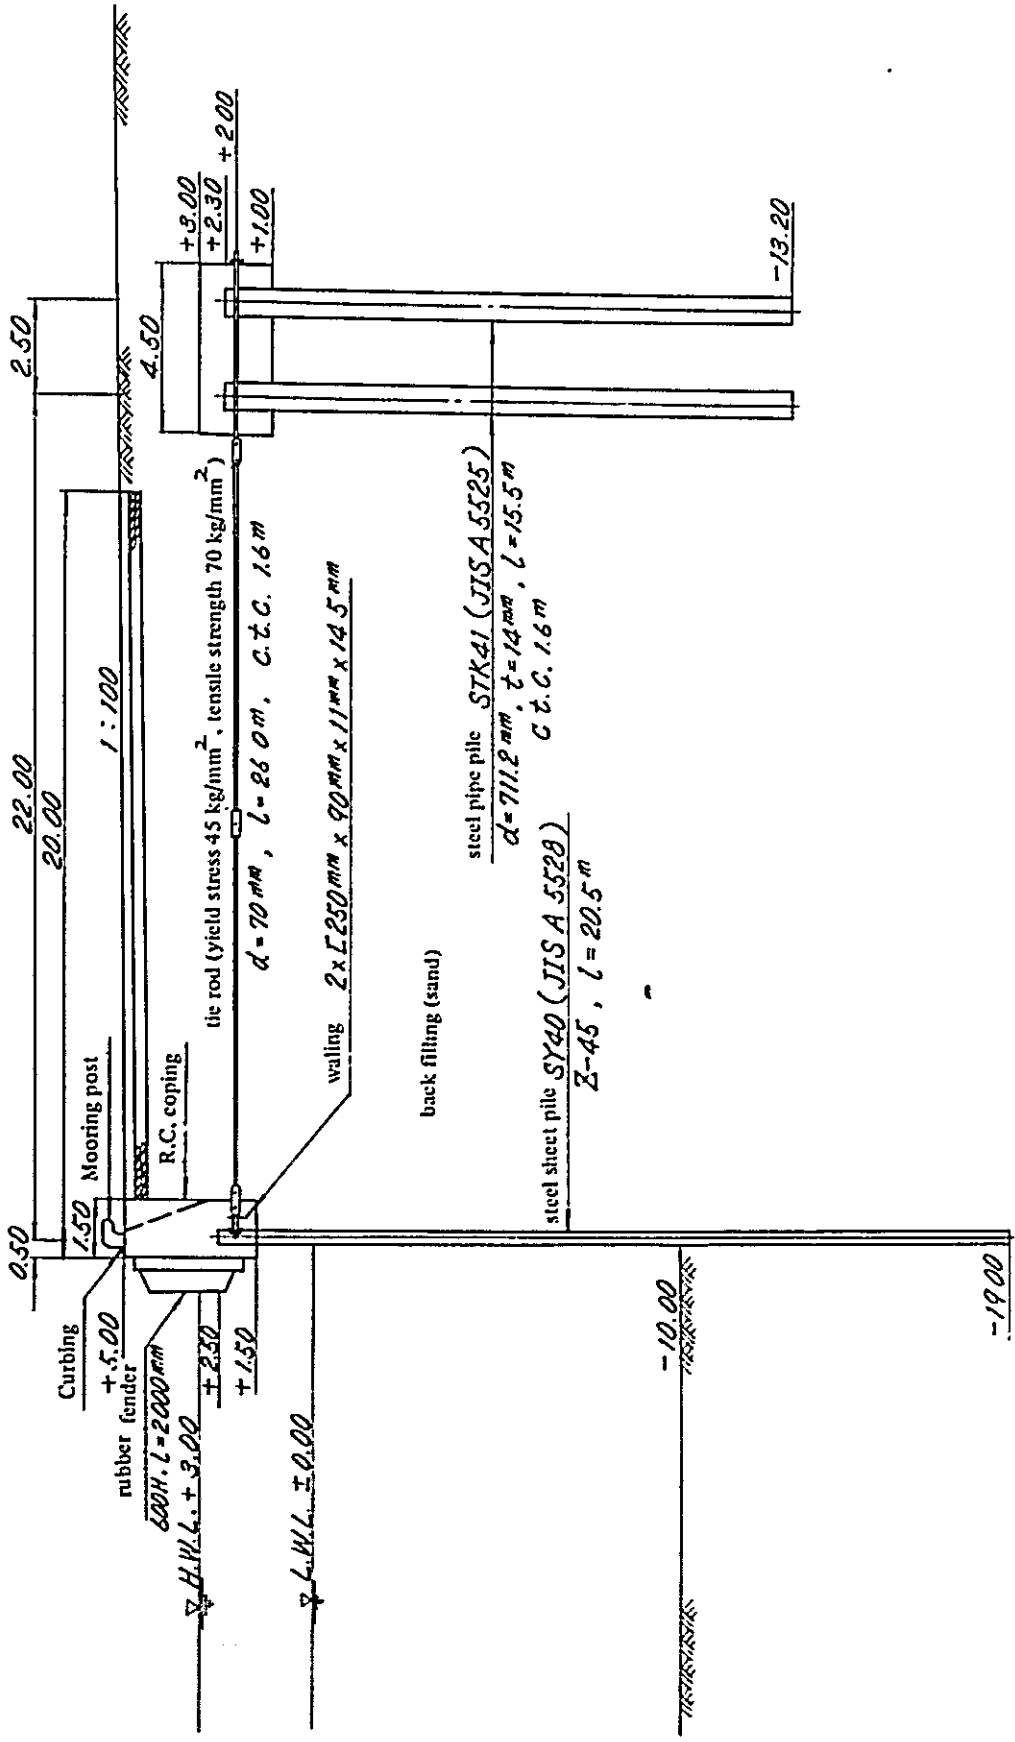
Standard Cross Section of 10m Quay Wall (South Caldera)
